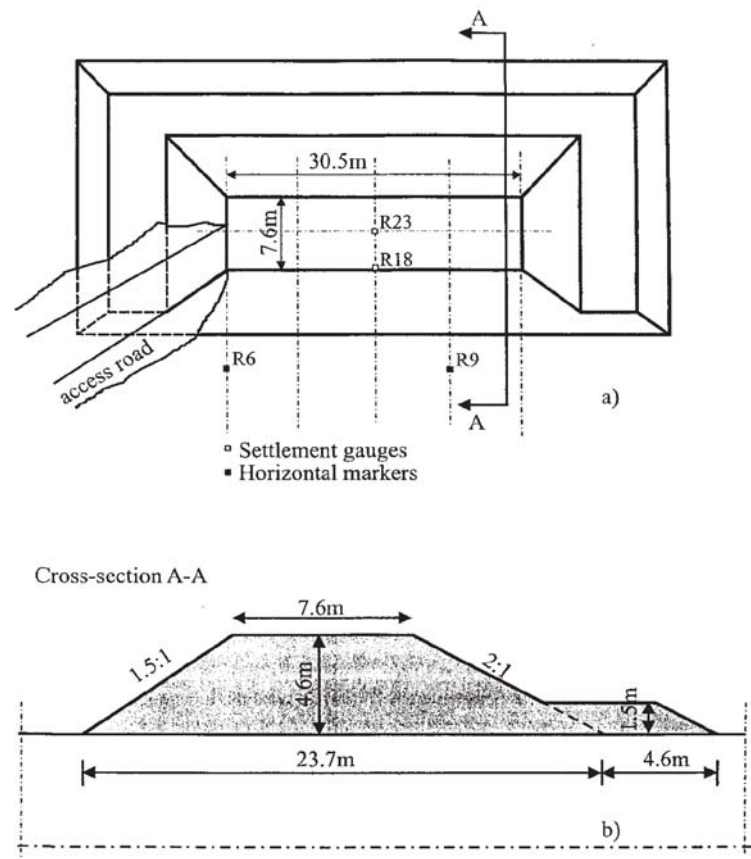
(a) Plane view and (b) Cross-section of the Saint-alban test embankment (Zdravkovic et al., 2001)
